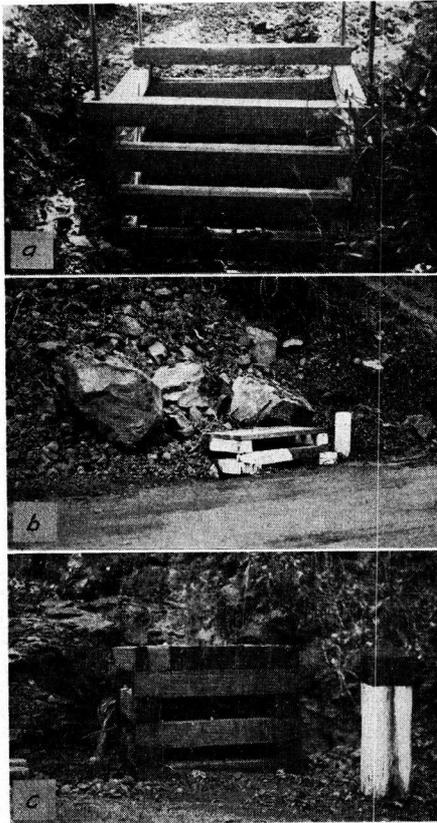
(a) Debris Crib of Reinforced Concrete with Provision for Vertical Extension Placed Over Culvert Entrance in Small Debris Basin and Commonly Known as a "Bear Trap." (b) Timber Debris Crib Installed Over Culvert Entrance in Roadway Gutter. Note how debris has been prevented from blocking culvert entrance. (c) Debris Crib of Hewn Timber with a Solid Cover Placed Over Culvert Entrance in Roadway Gutter.
